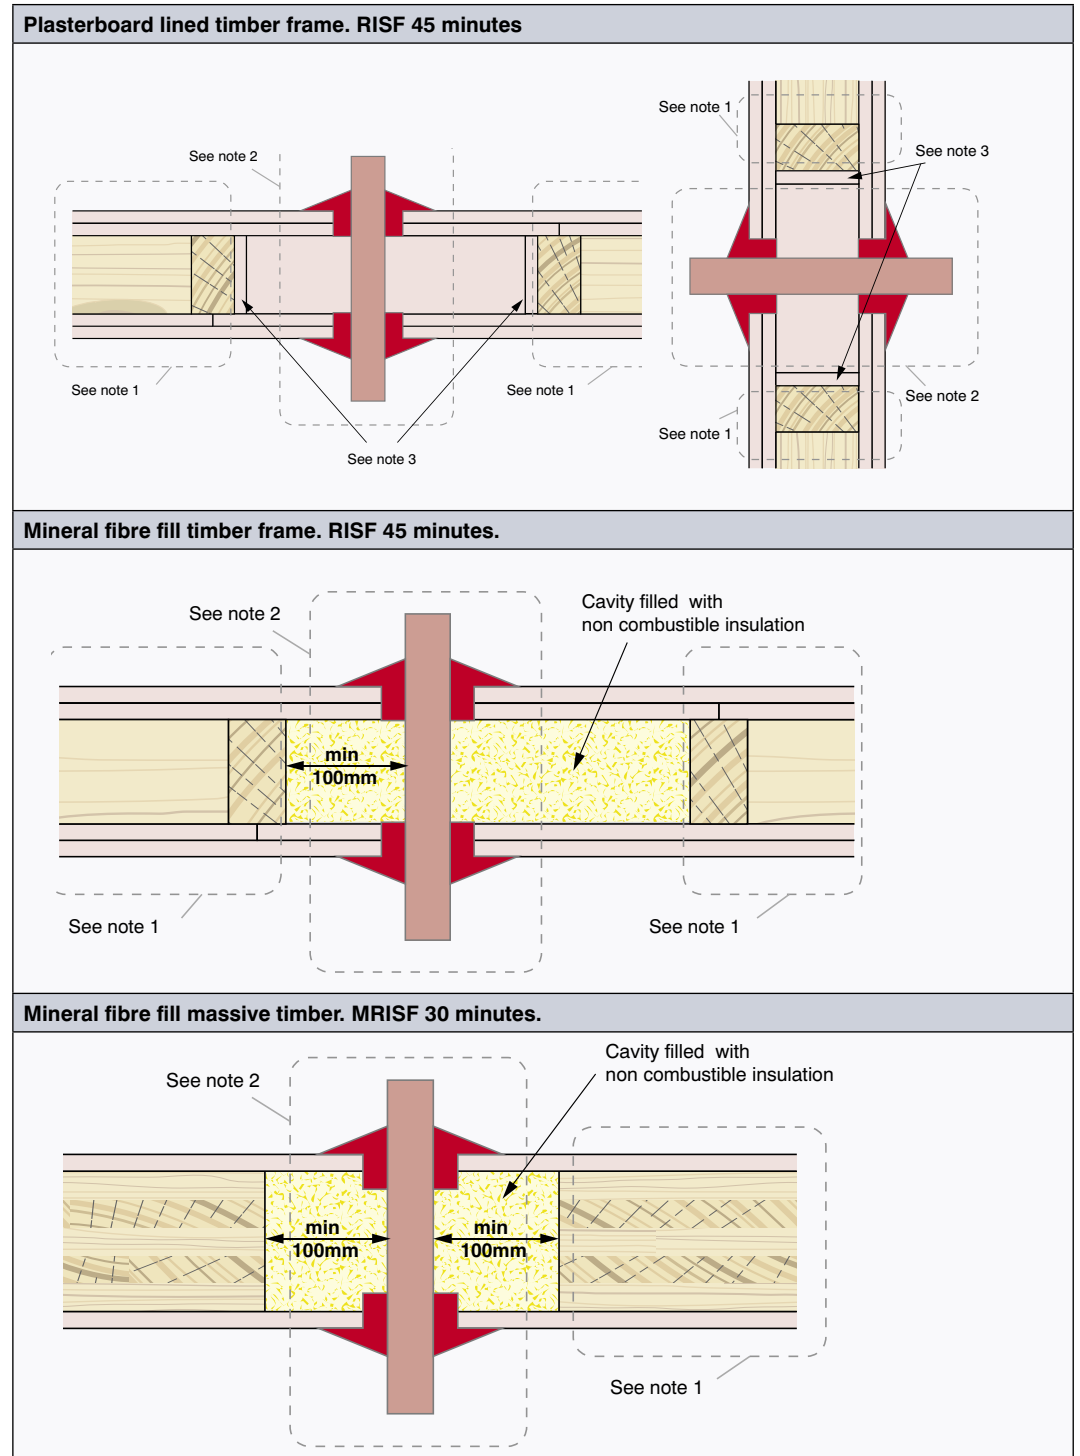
Pipe and cable penetrations through fire-protected timber
